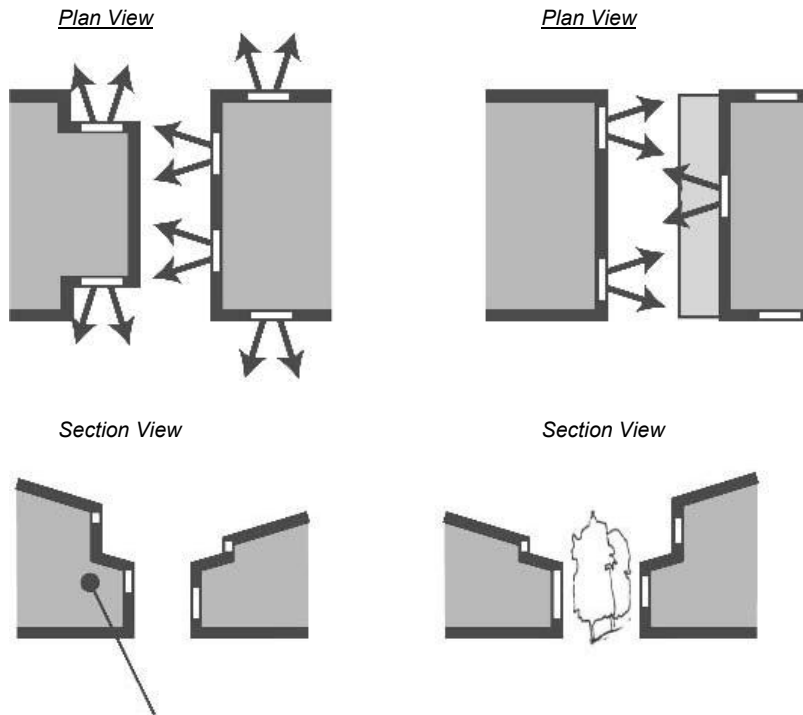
On top: Windows are arranged and offset from neighbors to maximize privacy. On bottom: High windows and clerestory windows allow light inside with minimal privacy impacts. Landscaping or obscure glass can also reduce privacy impacts. Note: When using landscaping to create privacy also consider the potential view impacts that could occur from mature trees.
